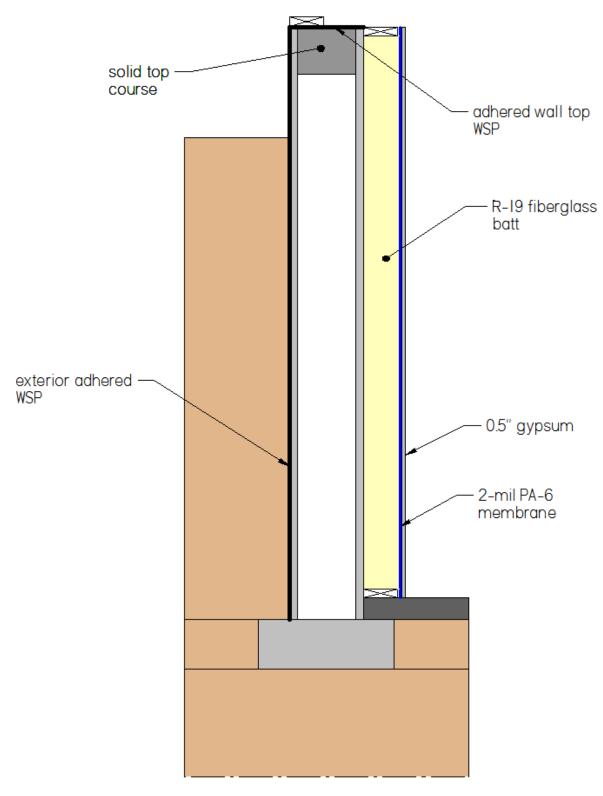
Base + exterior and wall top adhered WSP + interior R-19 cavity insulation + 2-mil. PA-6 warm side vapor retarder ("R19 int-EWSP")
